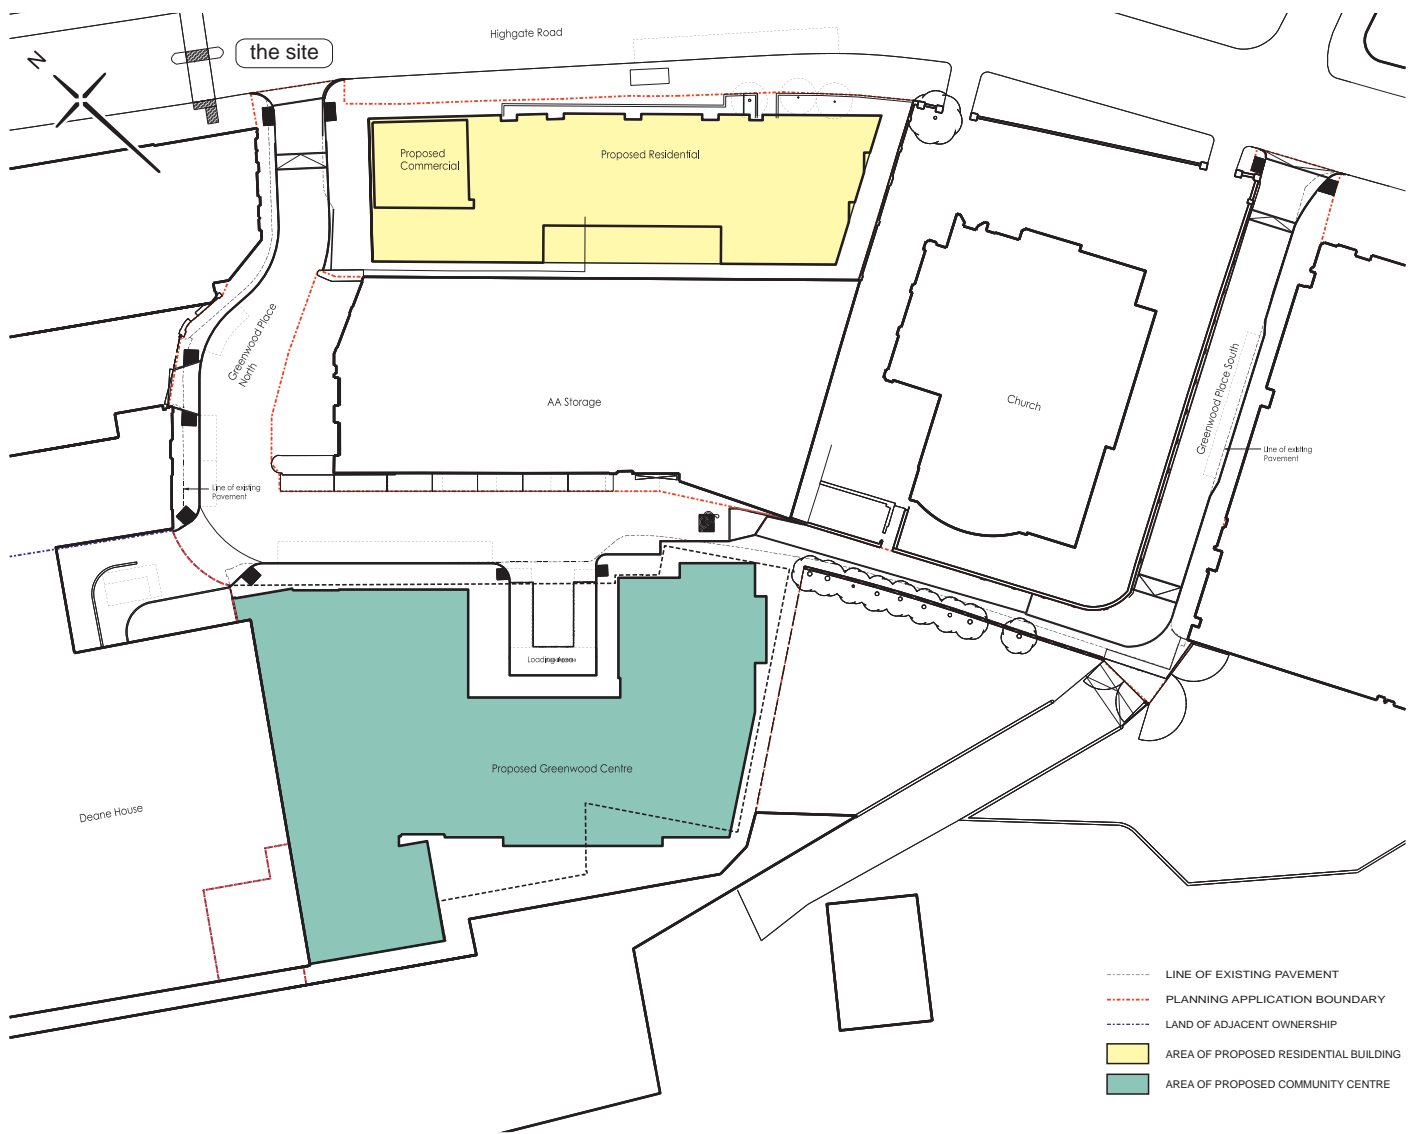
Proposed site layout (PCKO Architects, dwg 1213 SK 002, Rev B, date 09/08/13)
